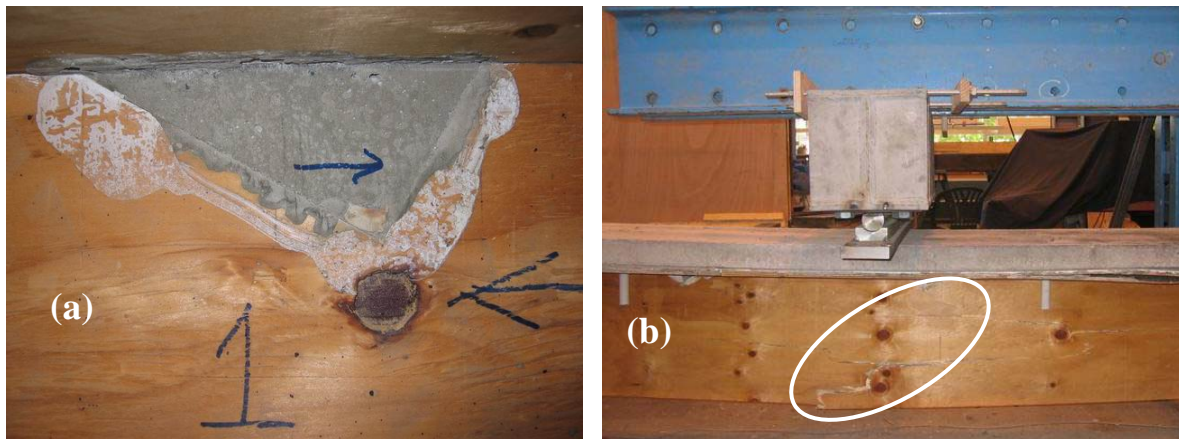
Beam C1: (a) no sign of failure in connections; (b) sudden bending tension failure in LVL at one third span
